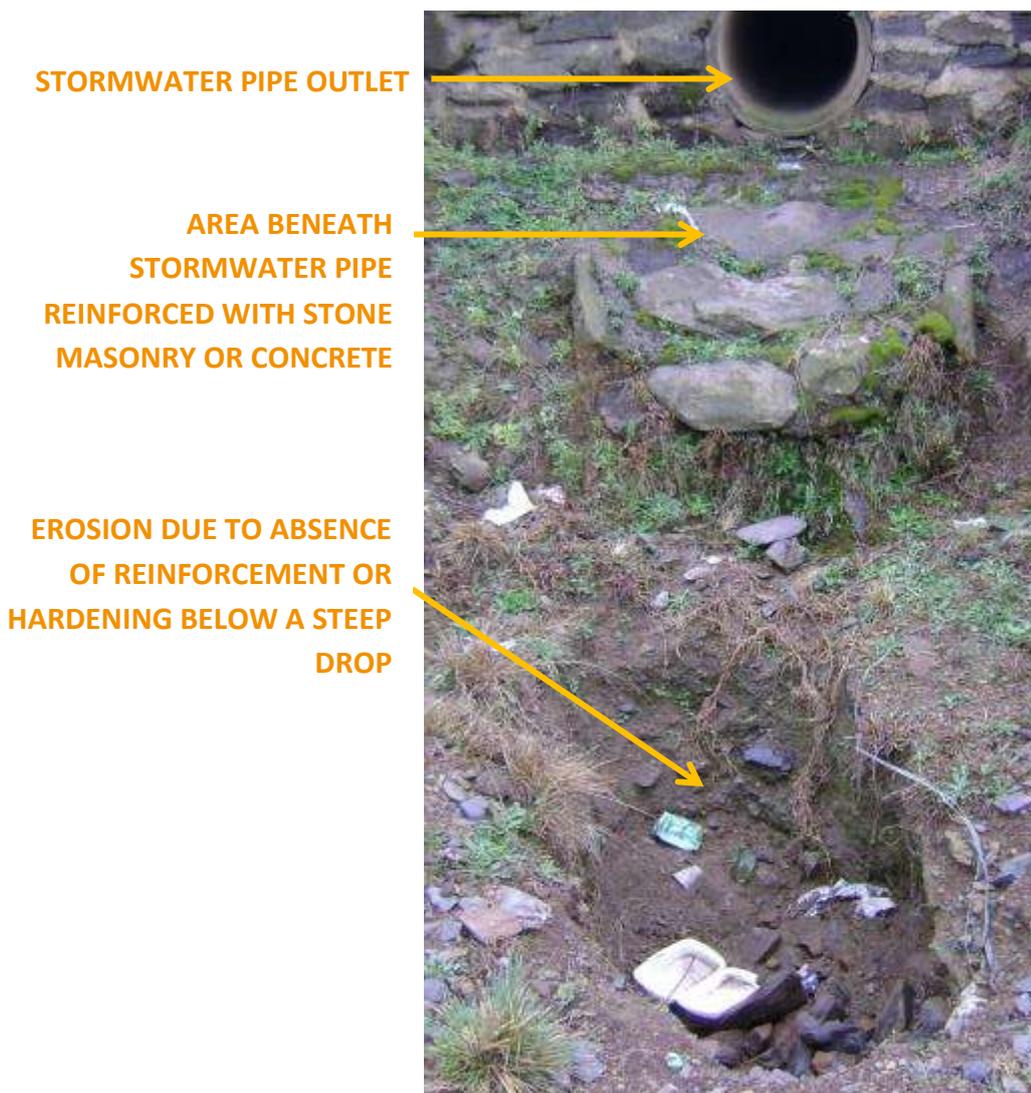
WHERE A STORMWATER PIPE DISCHARGES, THE LAND MUST BE ADEQUATELY PROTECTED/REINFORCED TO AVOID EROSION FROM FAST-MOVING WATER
